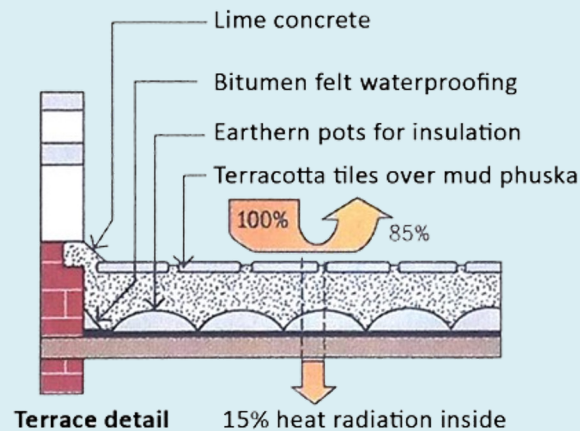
Roof detail showing use of earthen pots for insulation
